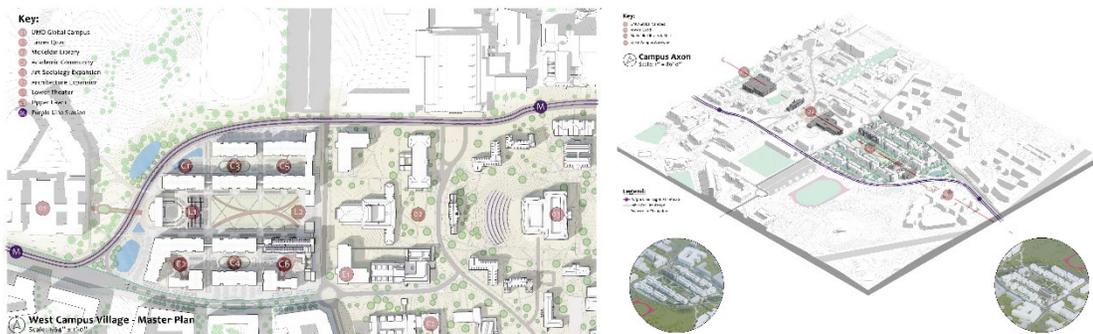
West Campus Village - Overall Master Plan & Axon. Drawn by Author
